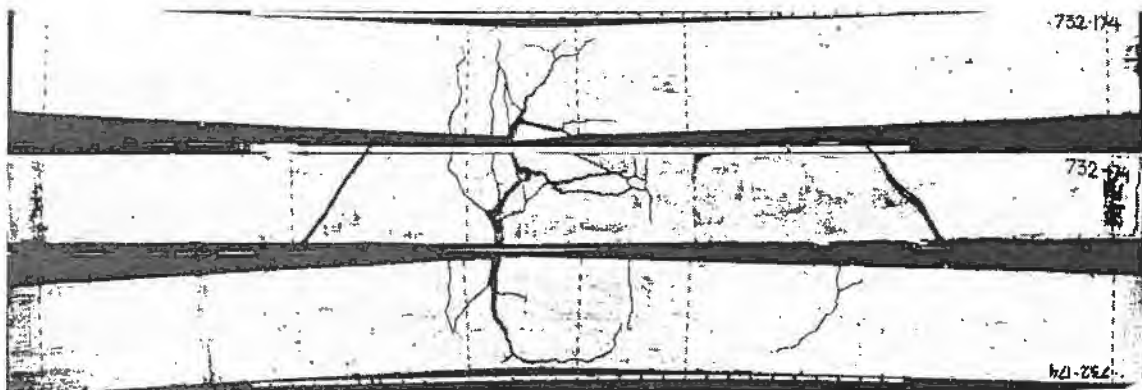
Beam 732-174 after fatigue failure of one bar of the tensile reinforcement. The middle splice of the second bar is destroyed after yielding of this bar by the pulsating load after the failure of the first bar. The tension face of the beam is shown in the middle.
